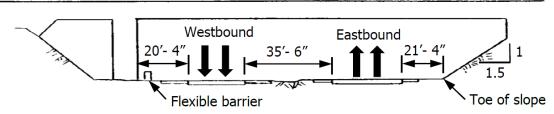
Bridge elevation view of horizontal clearances for separate westbound and eastbound highway features below the bridge, with flexible barrier.
